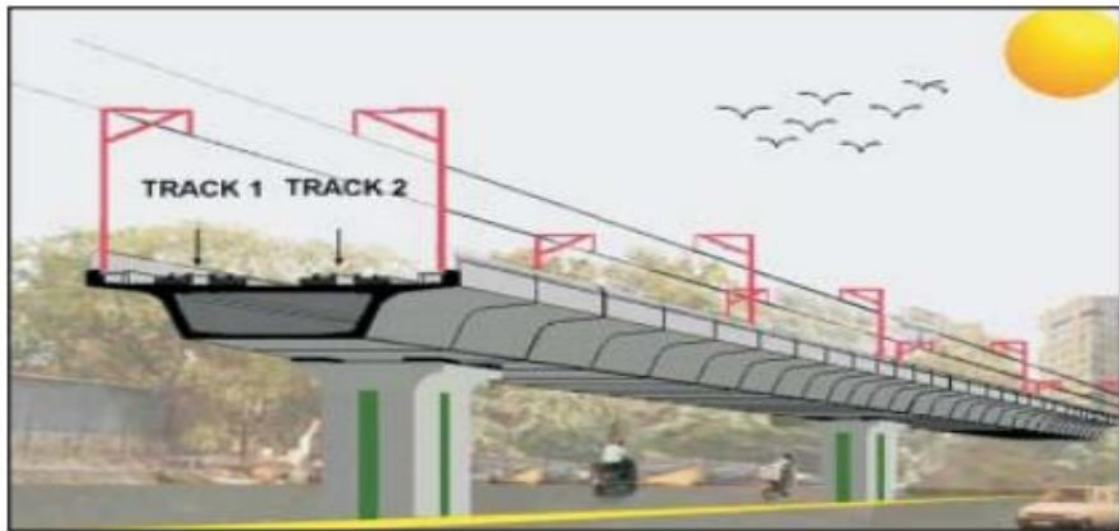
Box Girder (Precast Segmental) Supporting 2 Tracks
